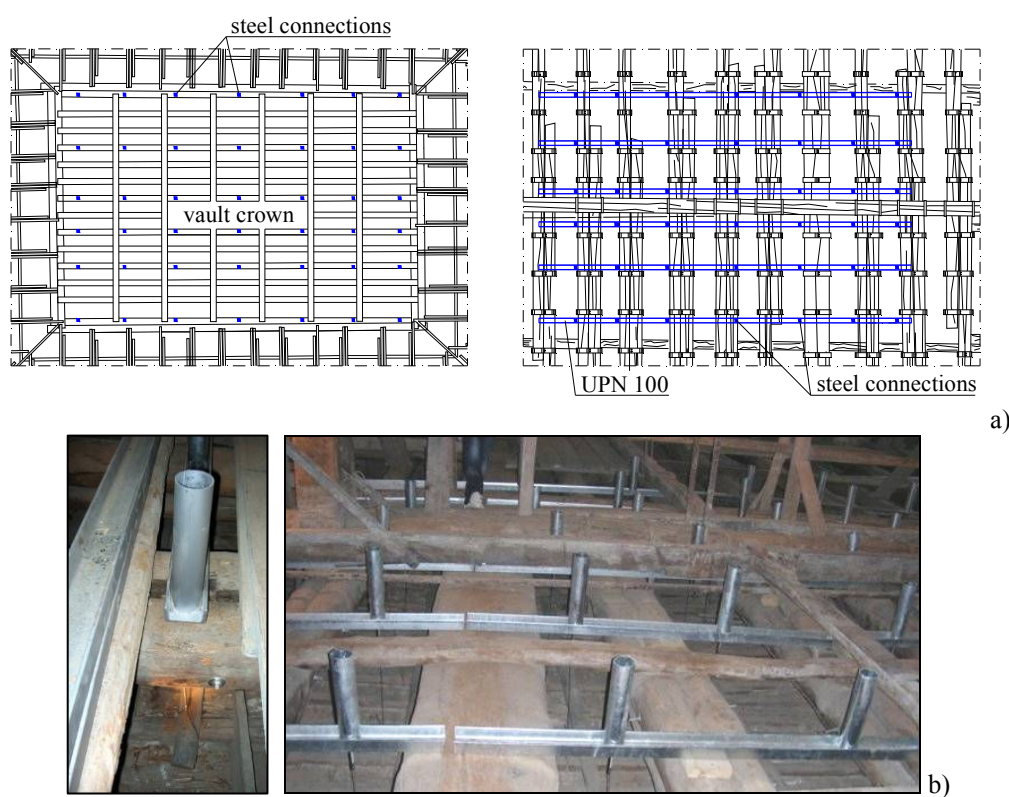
Diplomatic Hall (II) – Retrofitting interventions – Vault-floor connection:
